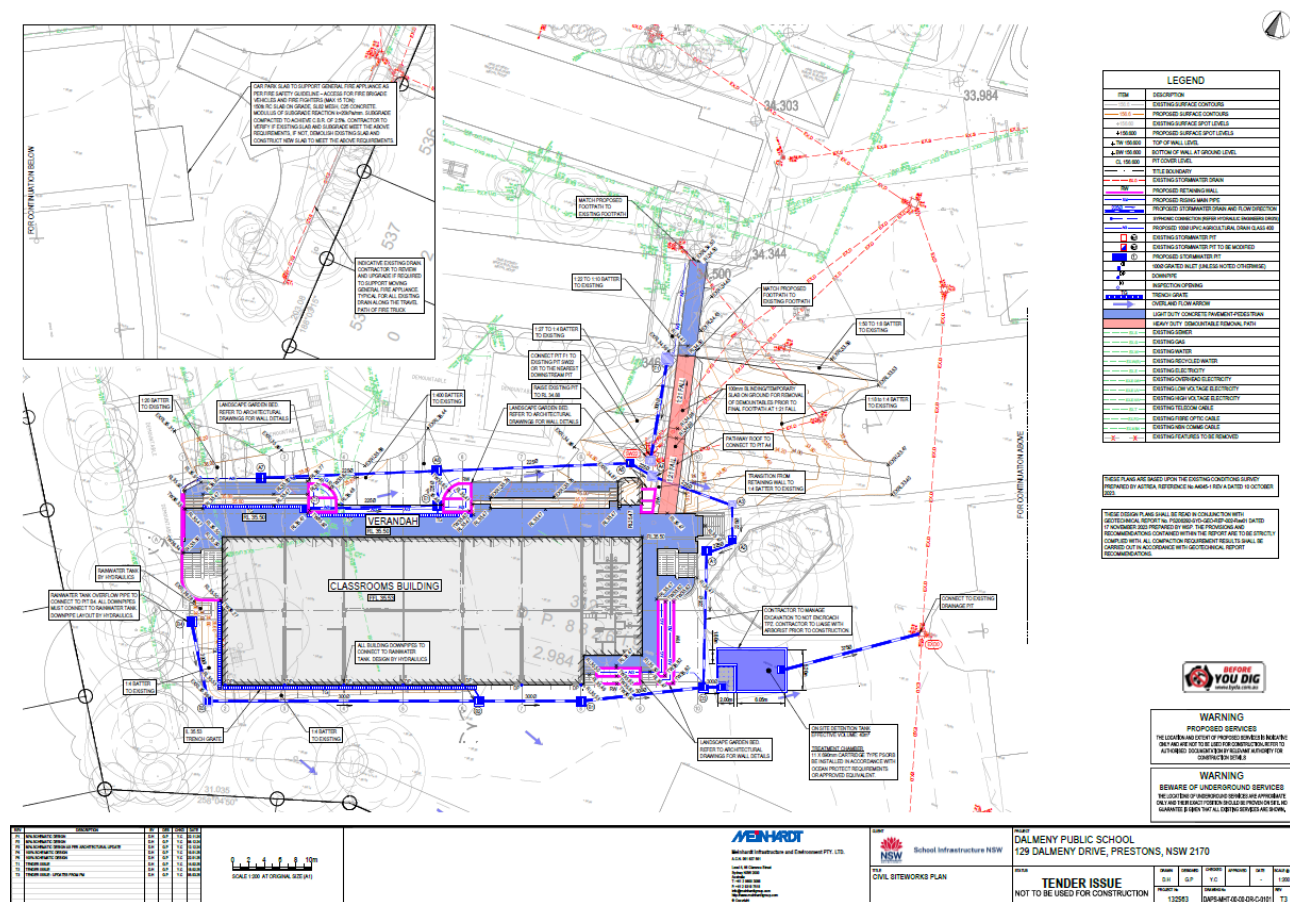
Civil Siteworks Plan. Source: Meinhardt
